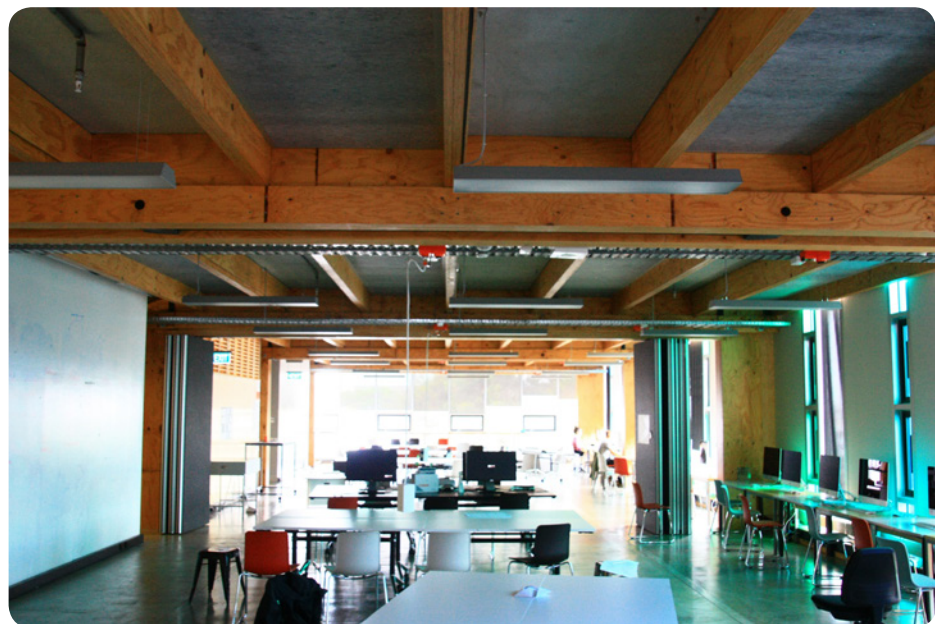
Timber post and beam construction – College of Creative Arts, Wellington, NZ.
